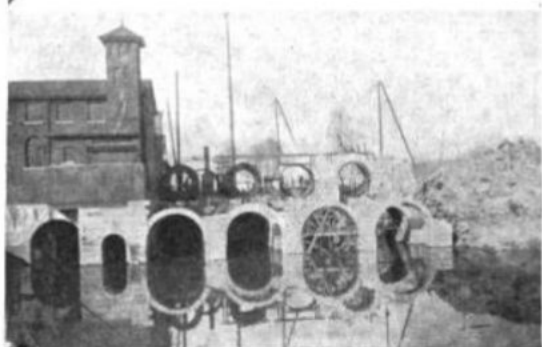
NEW FOUNDATIONS FOR ADDITION TO GARVIN'S FALLS POWER STATION.
